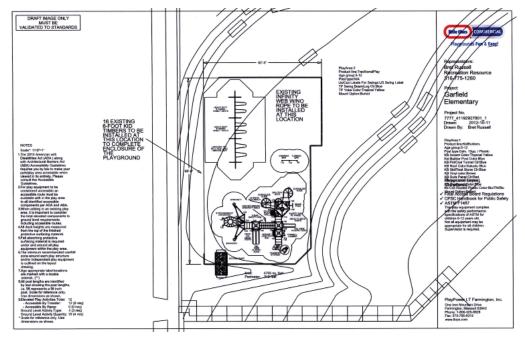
First through Fifth Grade Stationary Play Equipment Plan with Grading A four foot sloped terrace borders the stationary play equipment to the east
